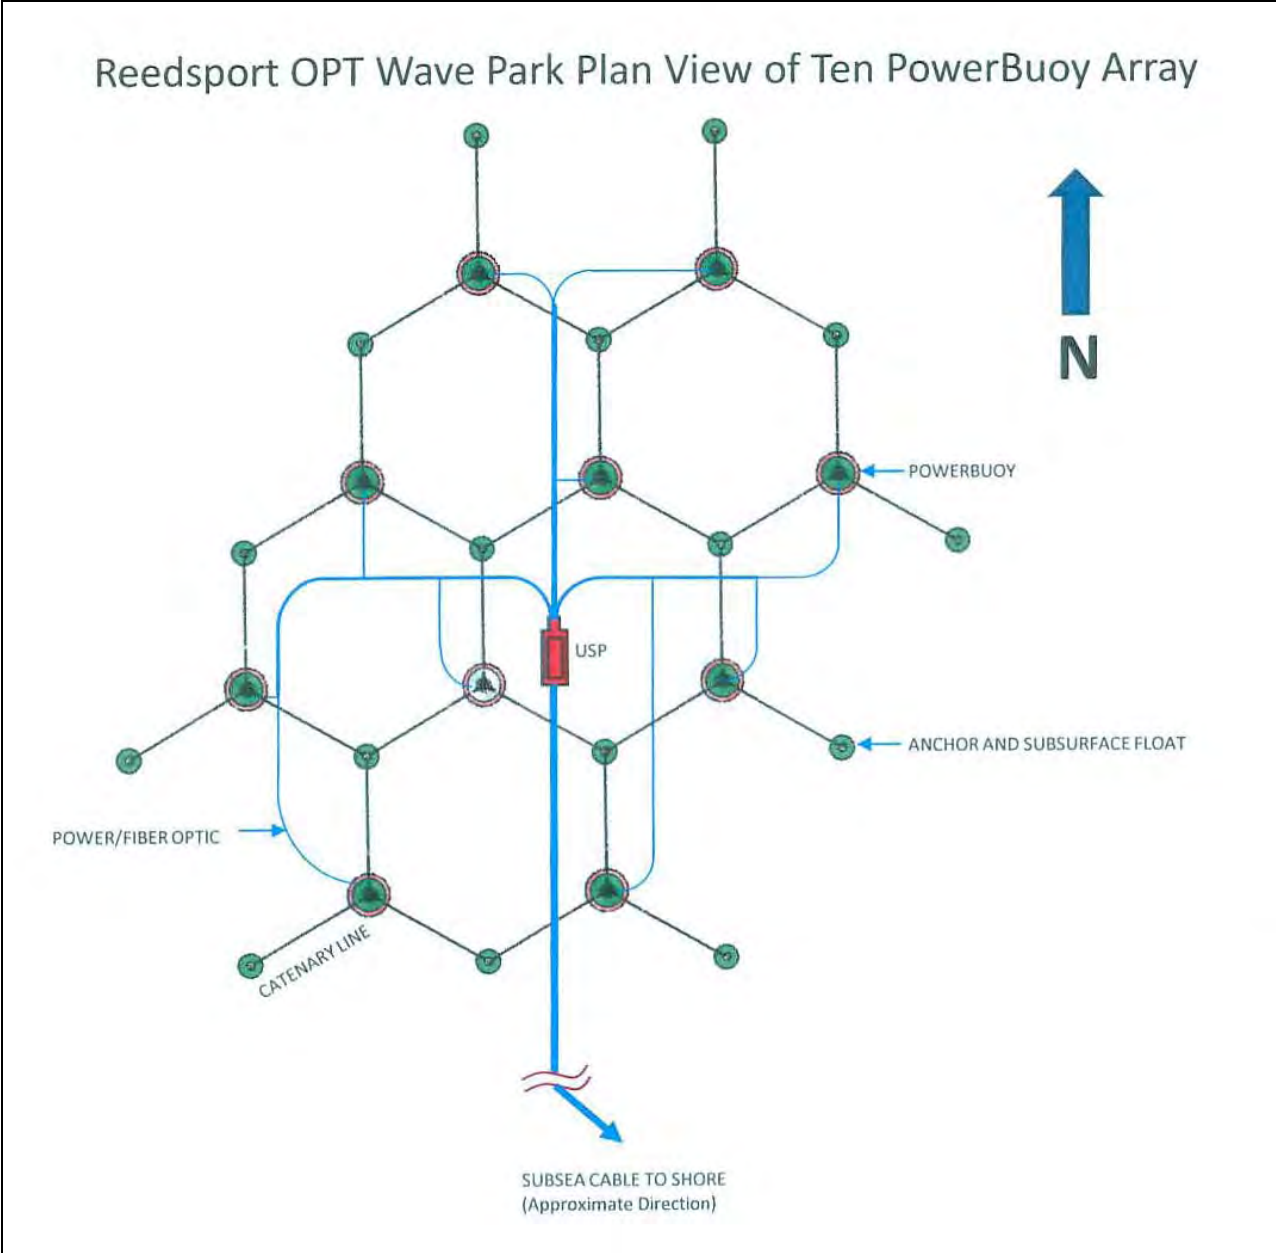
Project facilities—plan view (Source: OPT, 2010).
